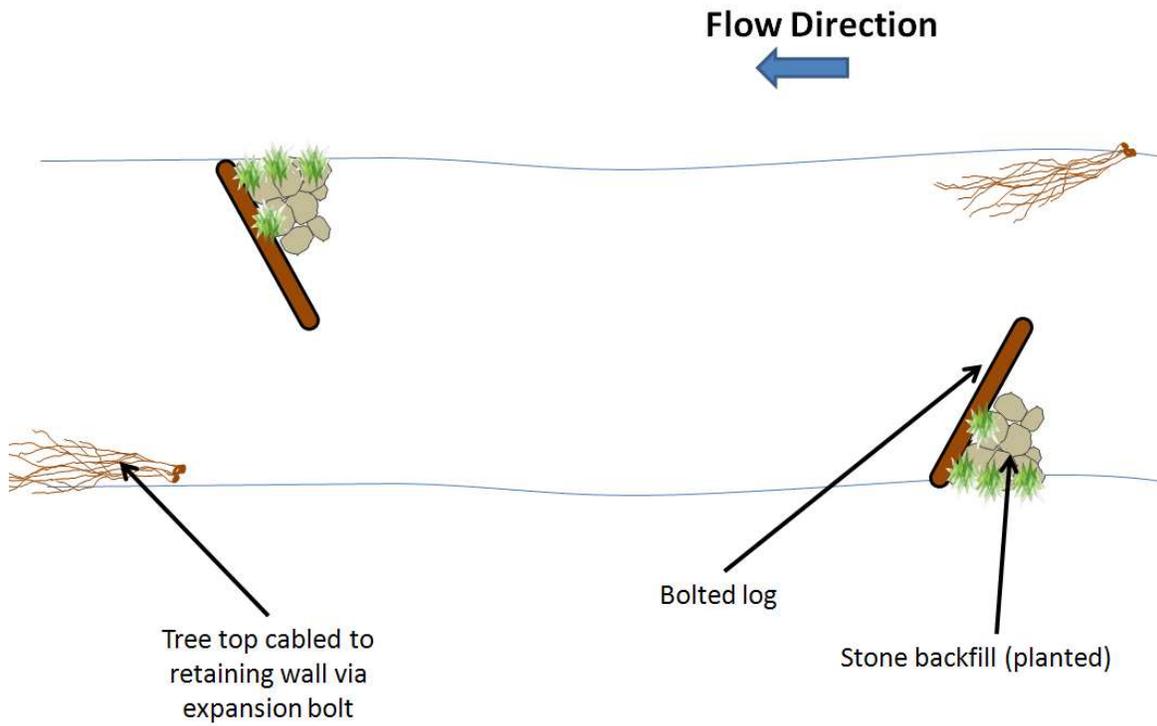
Schematic (plan view) of potential arrangement of suggested installations
